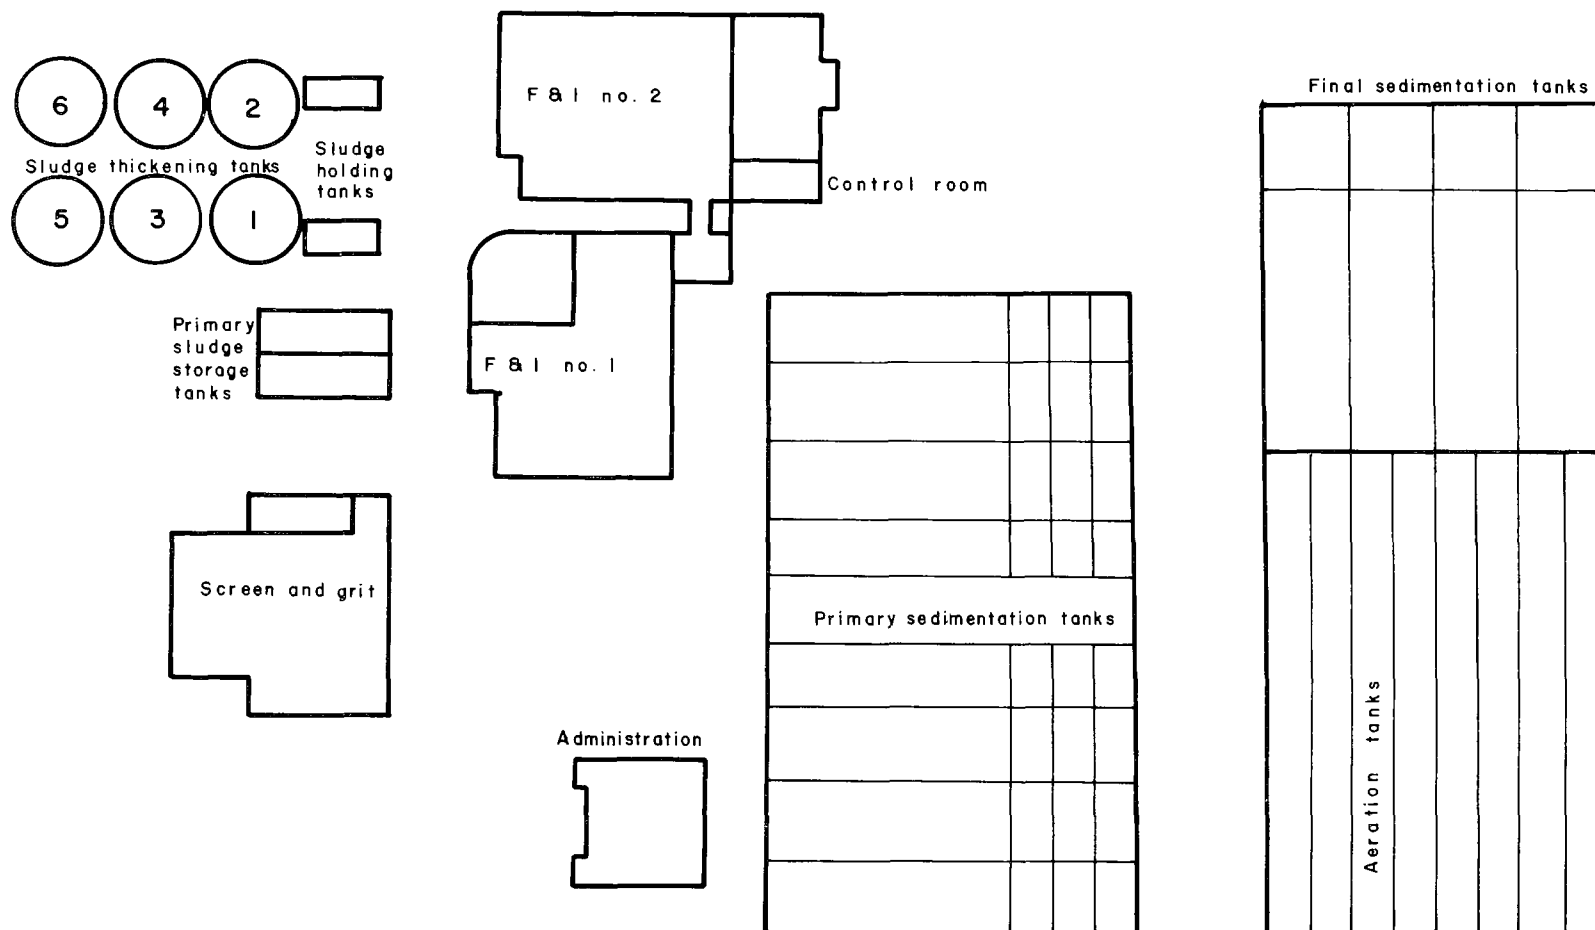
Plan view of existing treatment facilities at Metropolitan WWTTP.
